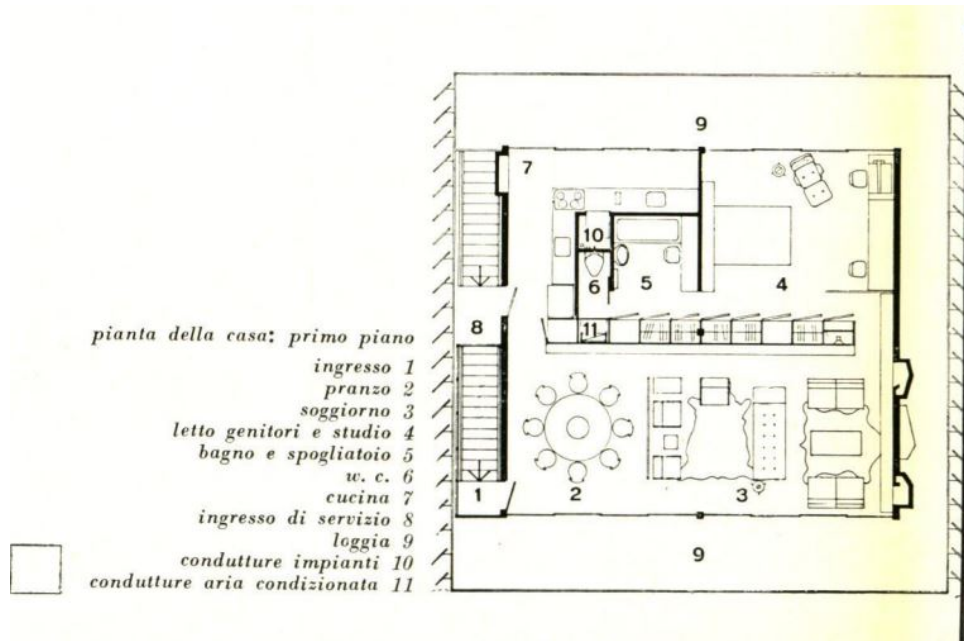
Upper Story Plan of Scott House, Accra, 1961²⁸⁰
